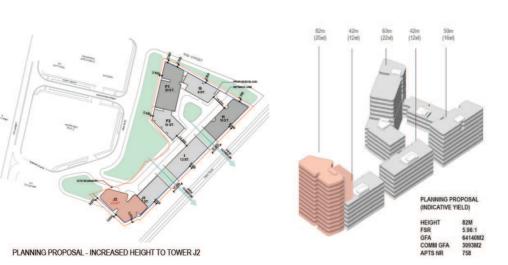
Extract from UDA by Plus Architecture showing footprint of Building J2 and site area for the land the subject of this Planning Proposal application (as outlined in red).
